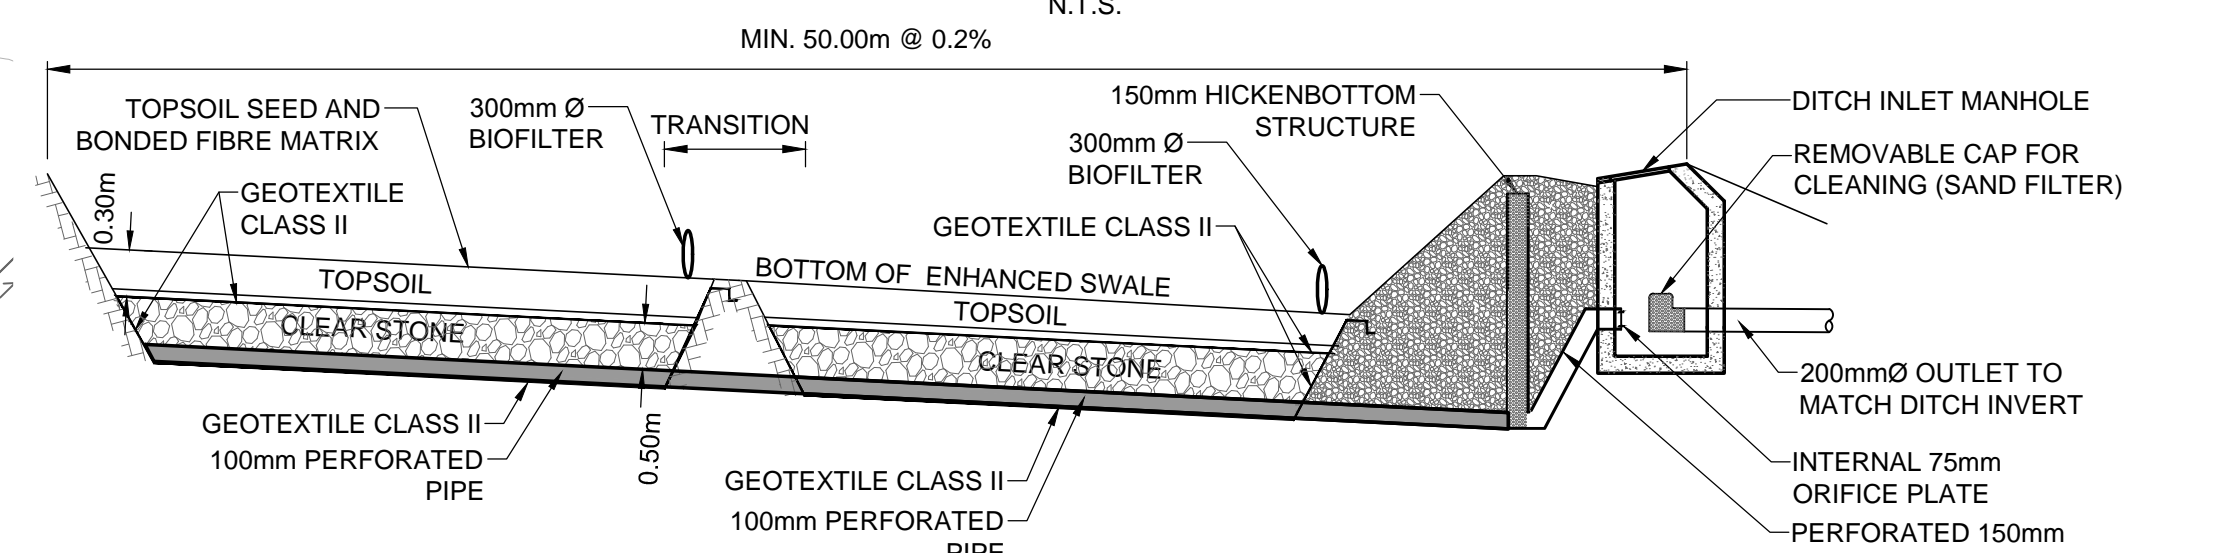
SWMF 3 OUTLET CONTROL STRUCTURE
